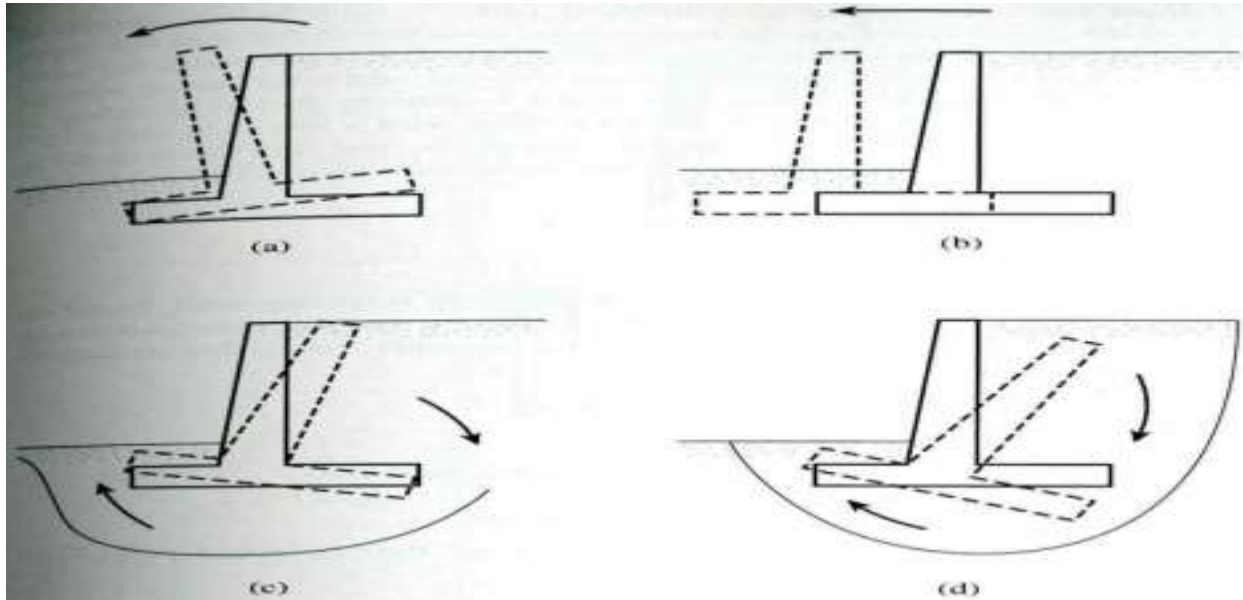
Failure of retaining wall: (a) by overturning; (b) by sliding; (c) by bearing capacity failure; (d) by deep-seated shear failure
